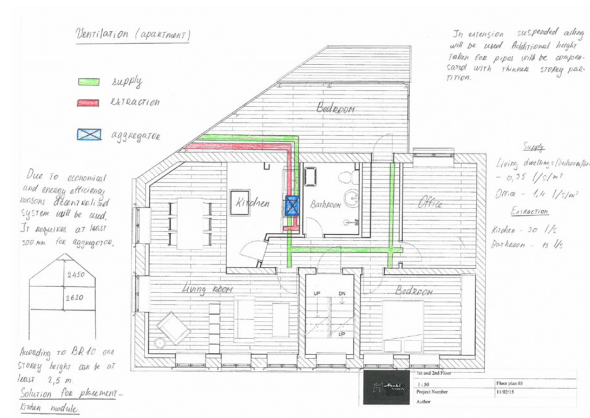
Ventilation Plan: 1st and 2nd Floors
